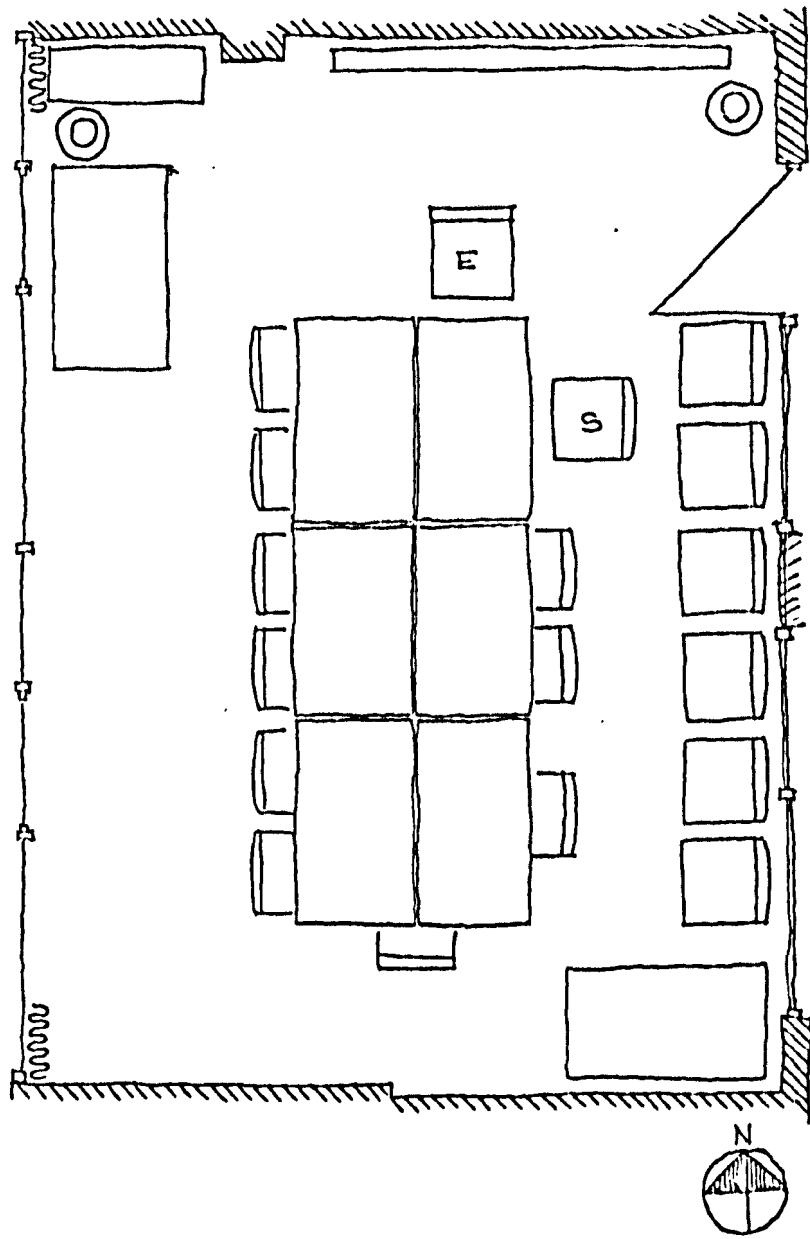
Plan of the seminar room used in Pilot Study I and II.
